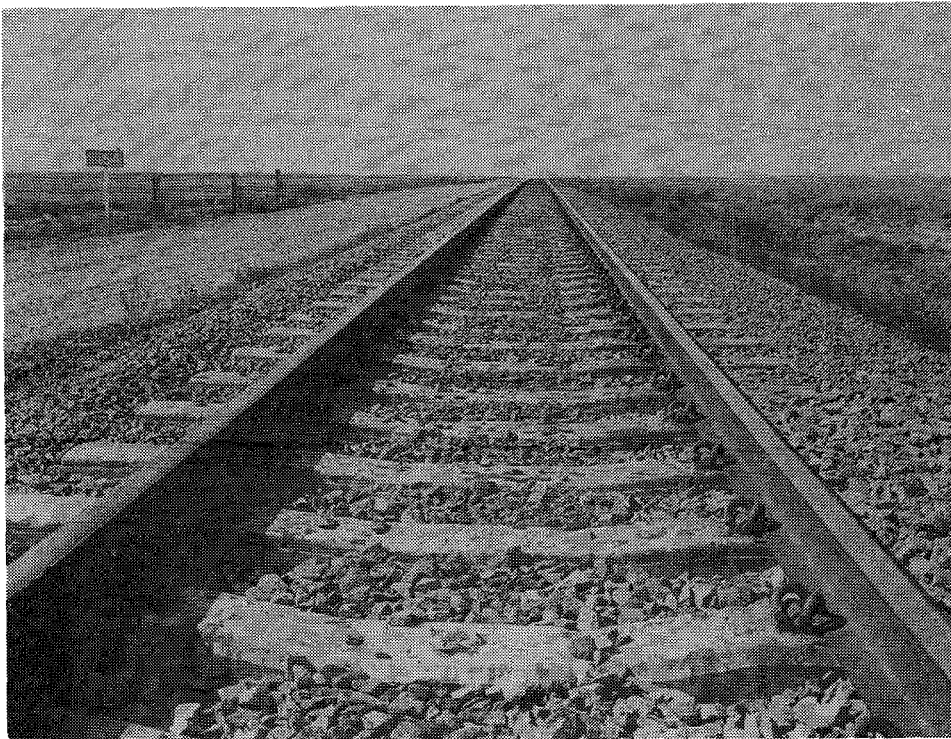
CONTINUOUS WELDED RAIL (CWR) ON CONCRETE TIES.
